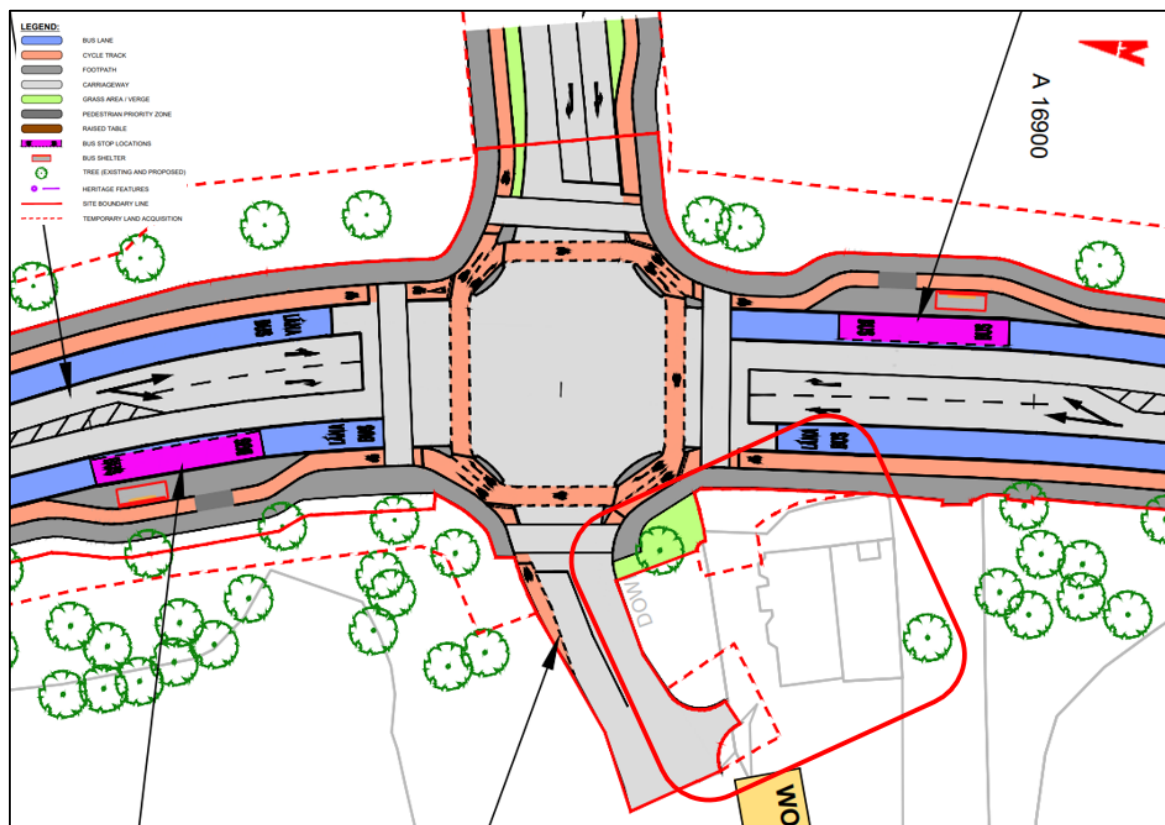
Extract from General Arrangement Drawing at Dublin Road (Sheet 48)
